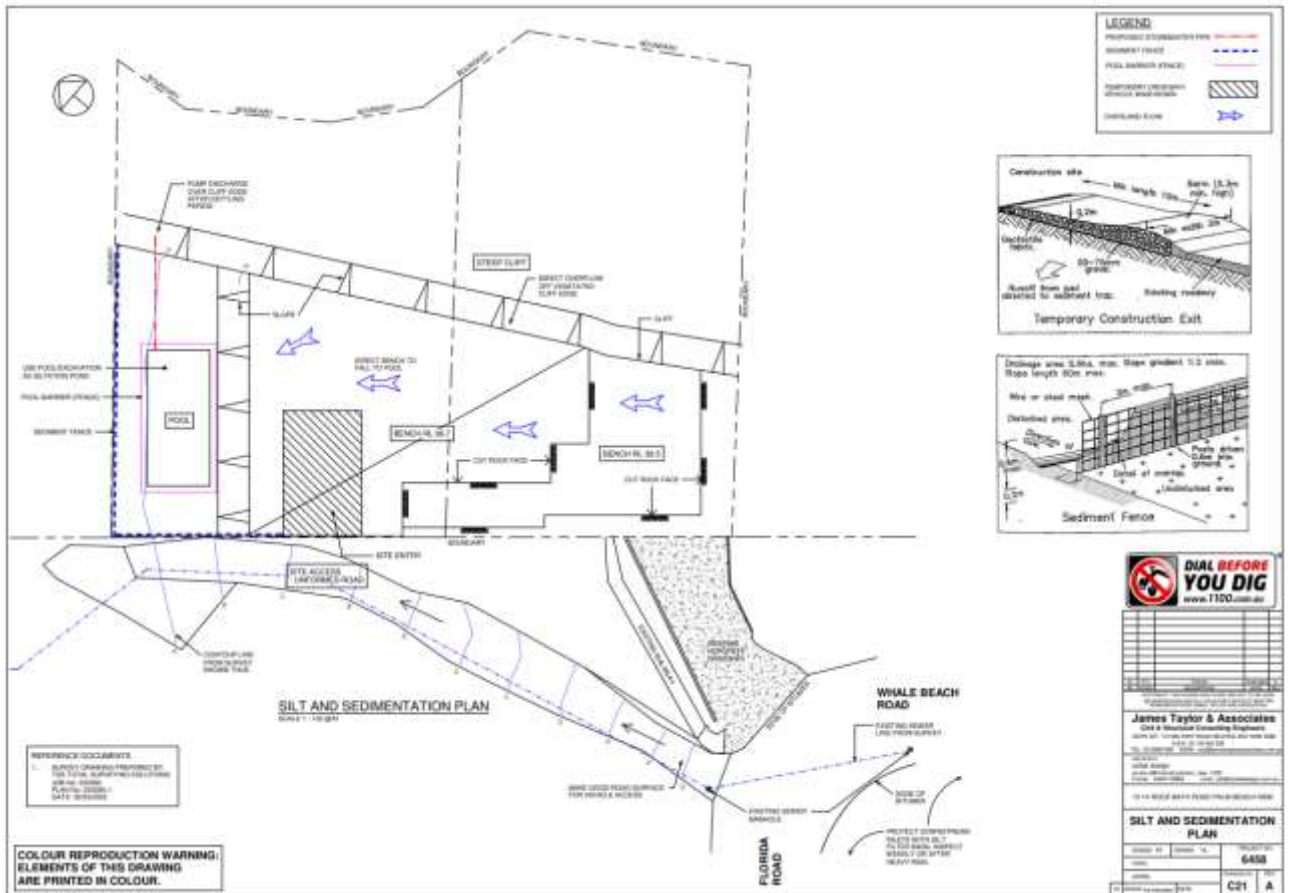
Silt and Sedimentation Plan indicating Site Access point on the western boundary accessed from the existing driveway.
